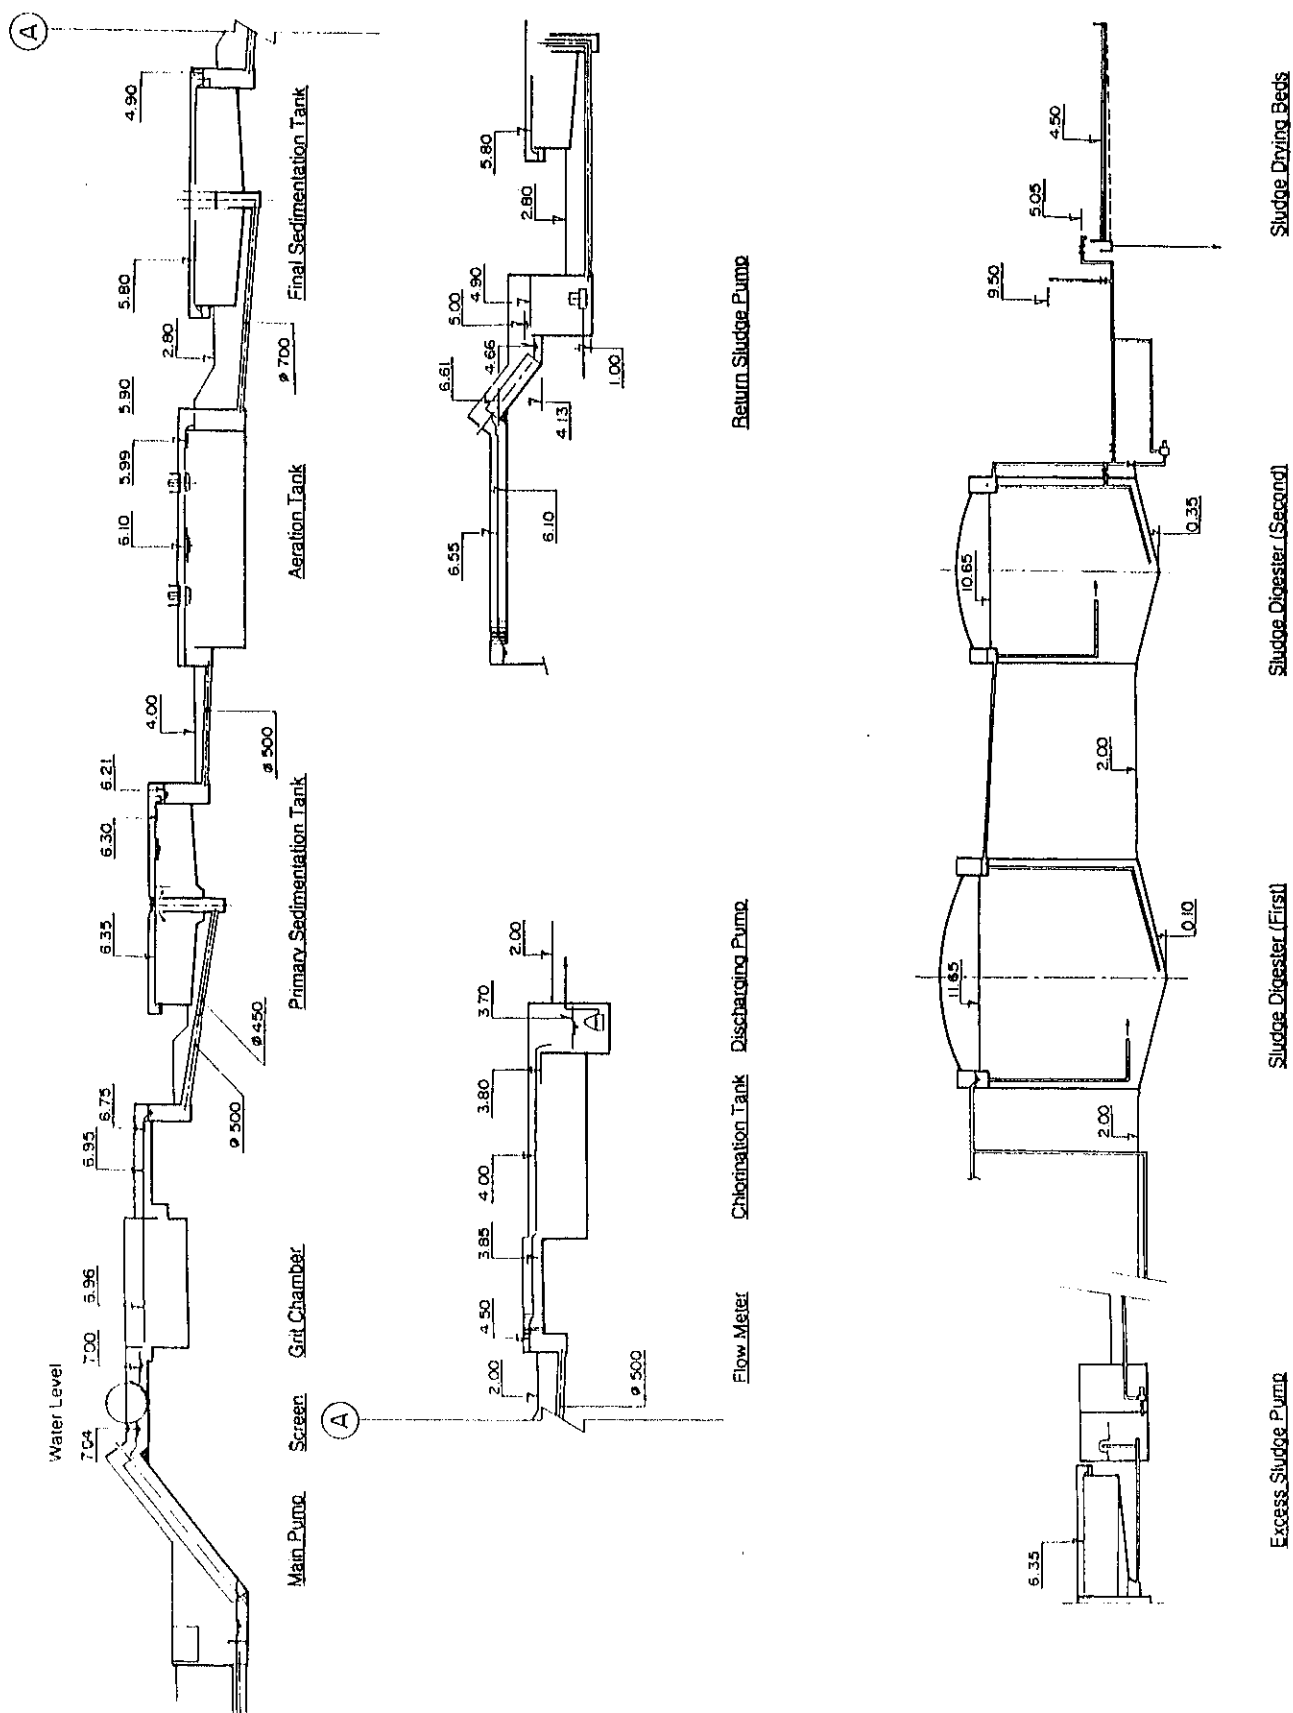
HYDRAULIC PROFILE OF CAMBERENE WASTEWATER TREATMENT PLANT
